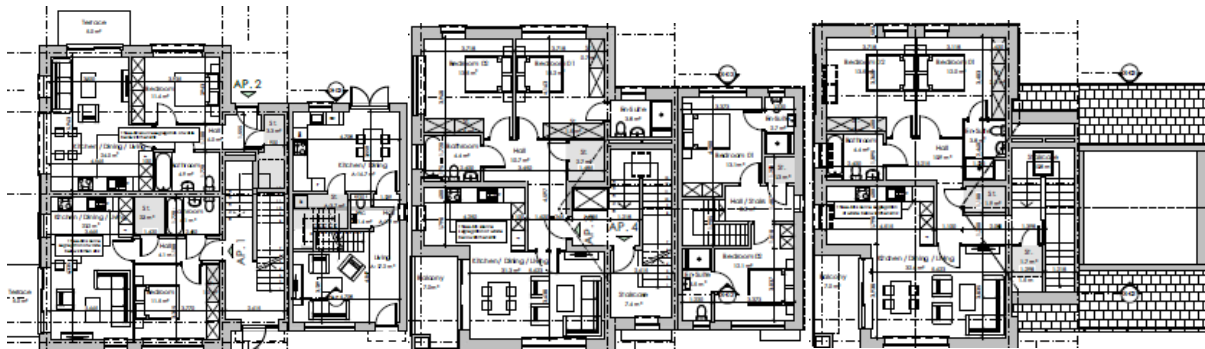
Ground (l), first (centre) and second (r) floor plans for apartment building A1/A2.
